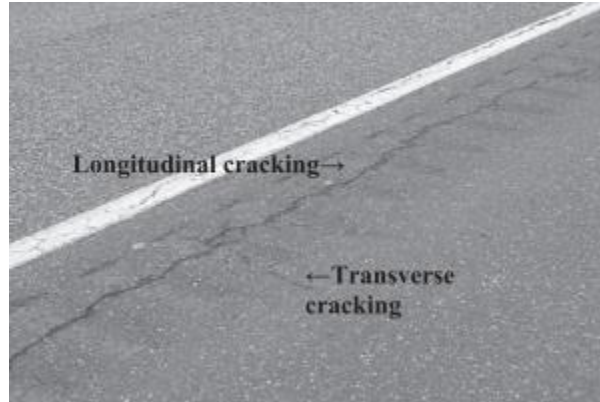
Transverse and longitudinal cracking at milled rumble strips (Coffey and Park, 2016)
